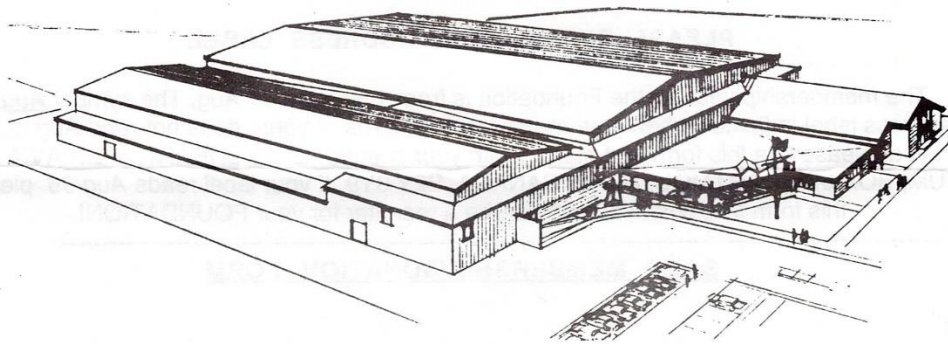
PHOTO OF THE PLAN FOR THE MUSEUM EXPANSION
